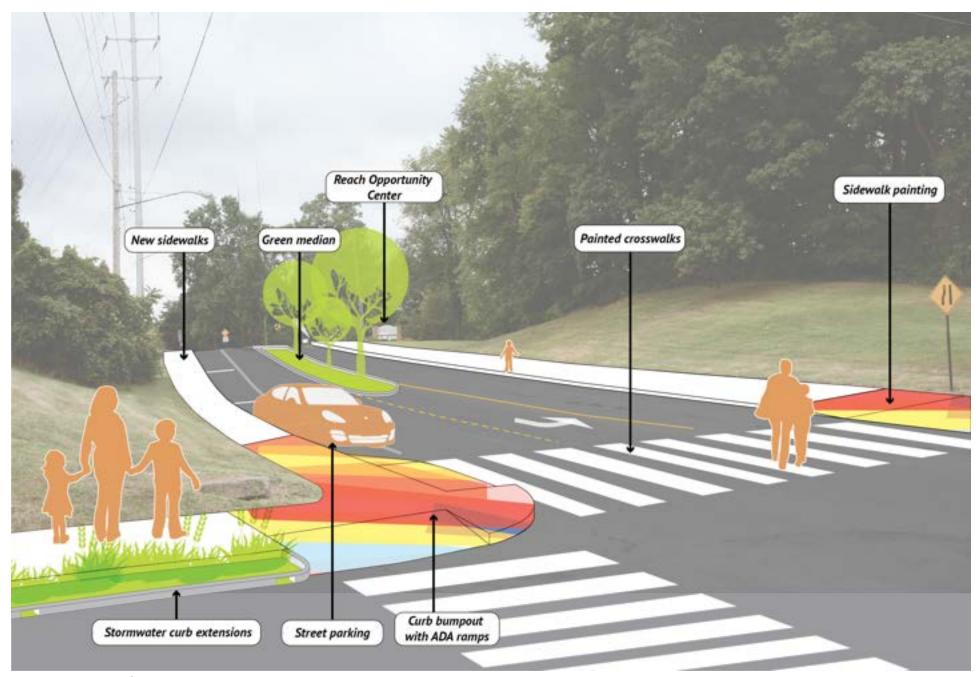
Diagram of potential street improvements at Lakeshore Boulevard & Crosier Avenue
